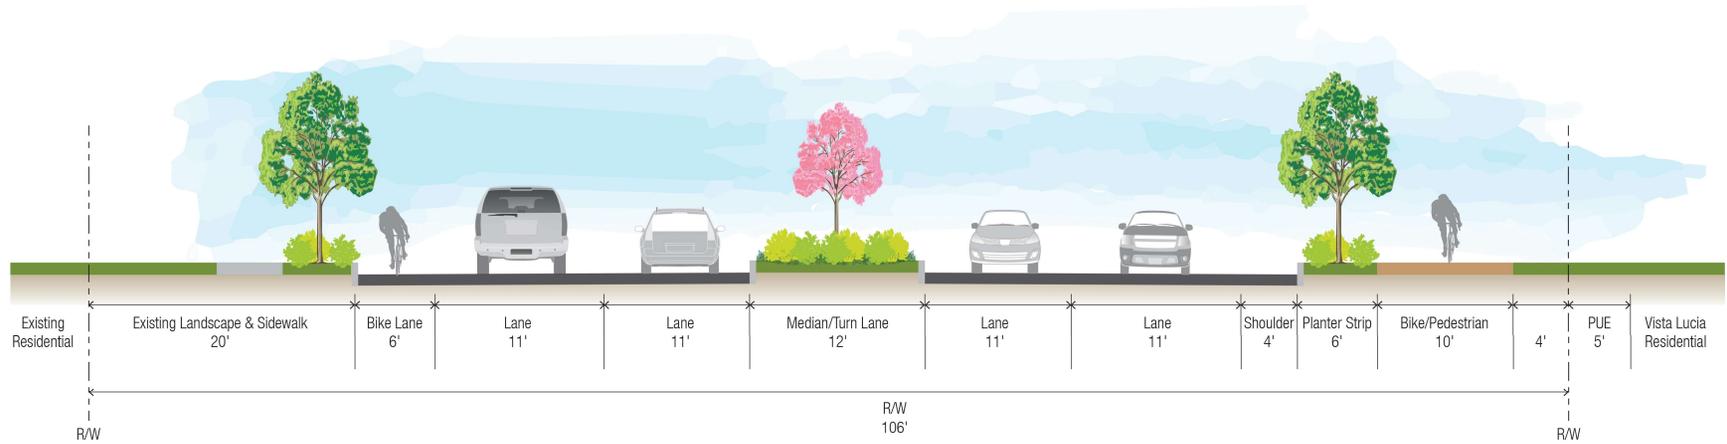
4-Lane Arterial Section--Fanoe Road north from Burgundy Way to Rhone Way Looking North
